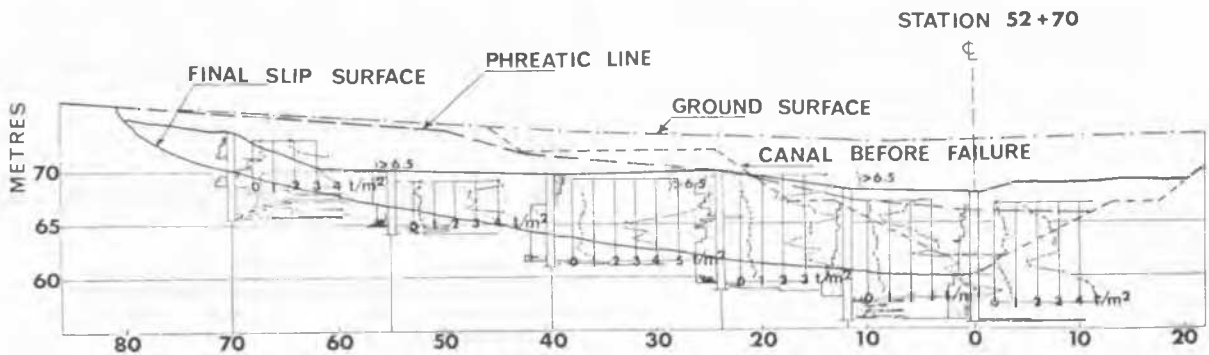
Cross Section from the Failure Area after the Slide, Station 52 + 70
